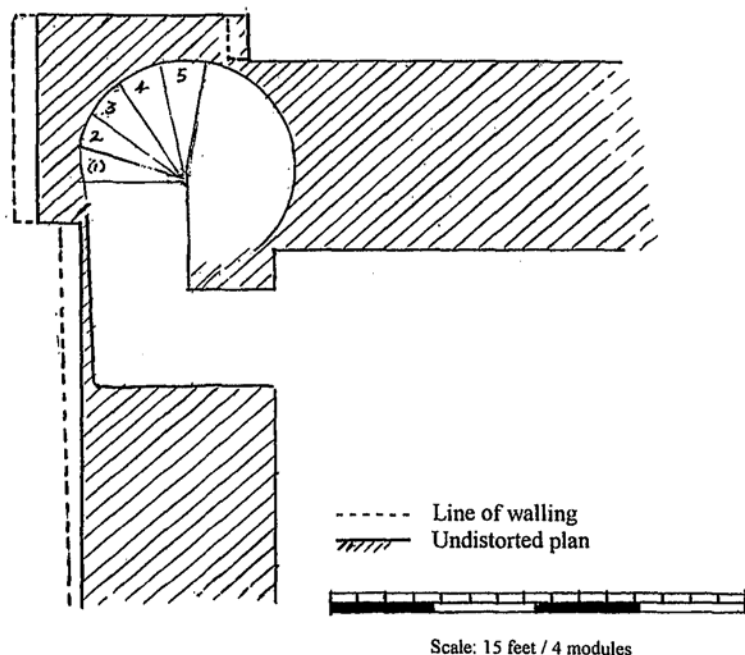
St Leonard's Tower: plan of north-west angle (basement floor level), showing alignment of the west wall and angle buttresses.
